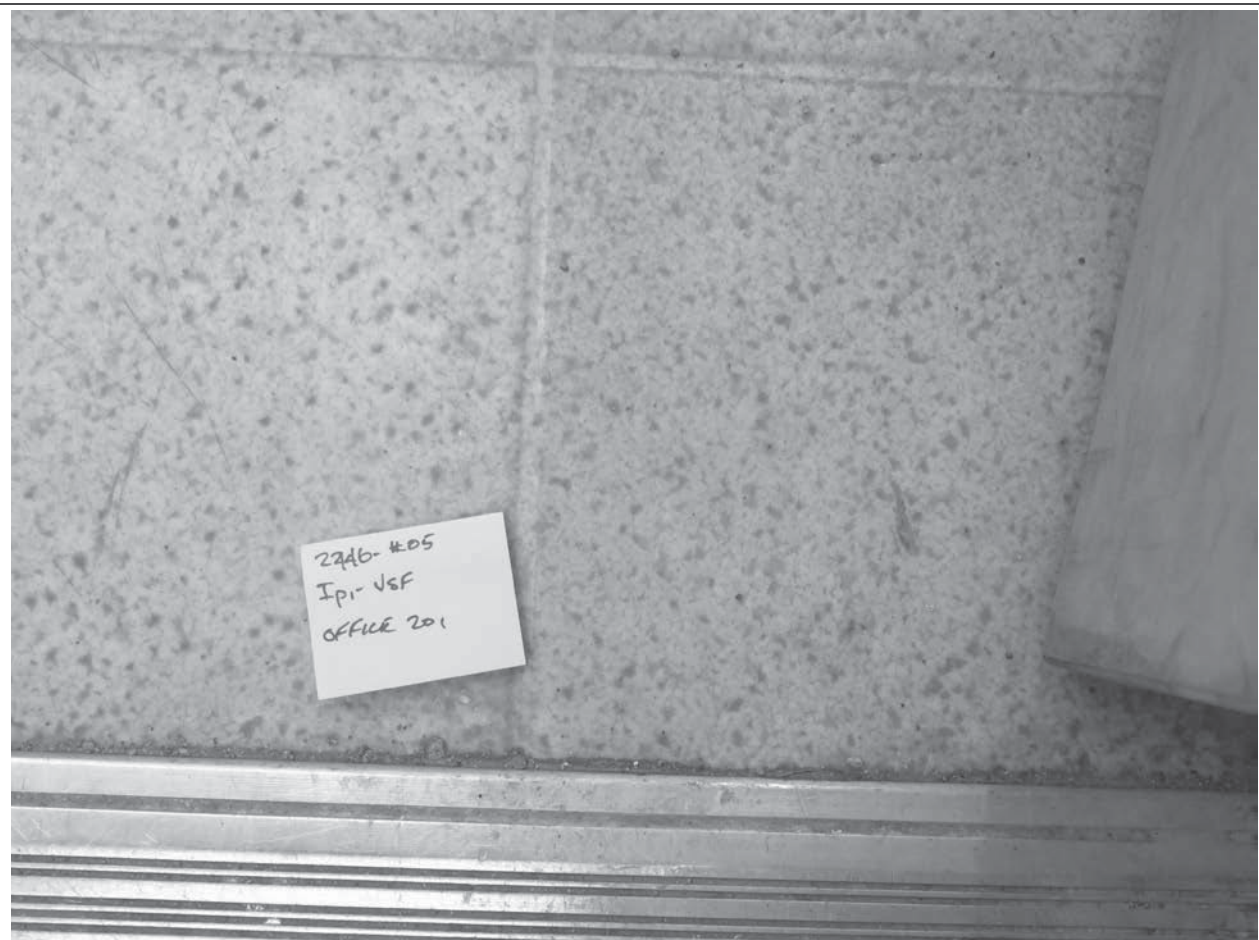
Sample 1 – (H1) Asbestos Floor Tile
